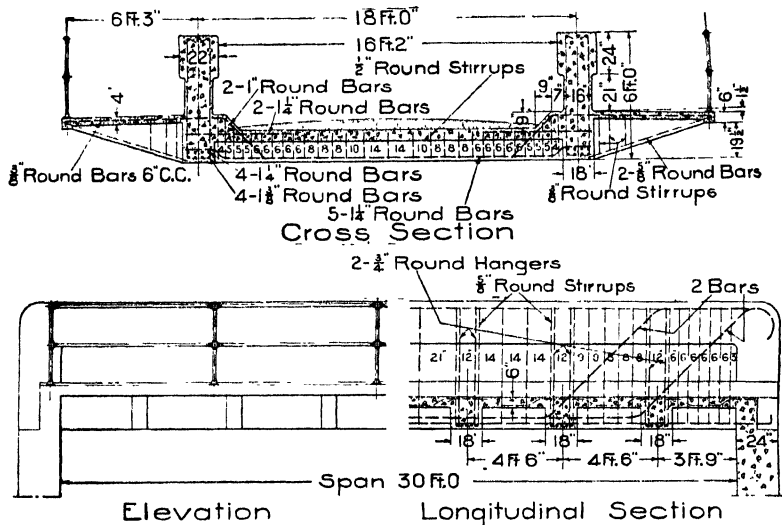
Design for a Girder Bridge (See p. 704.)
